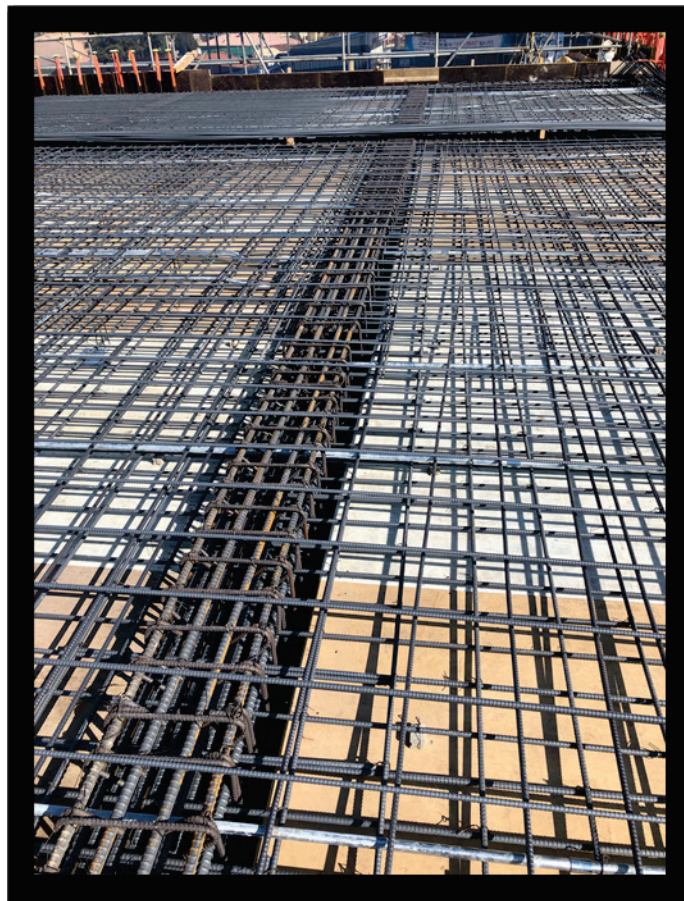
Typical rebar placement showing intersection between slab and beam (Parking Garage 4).
